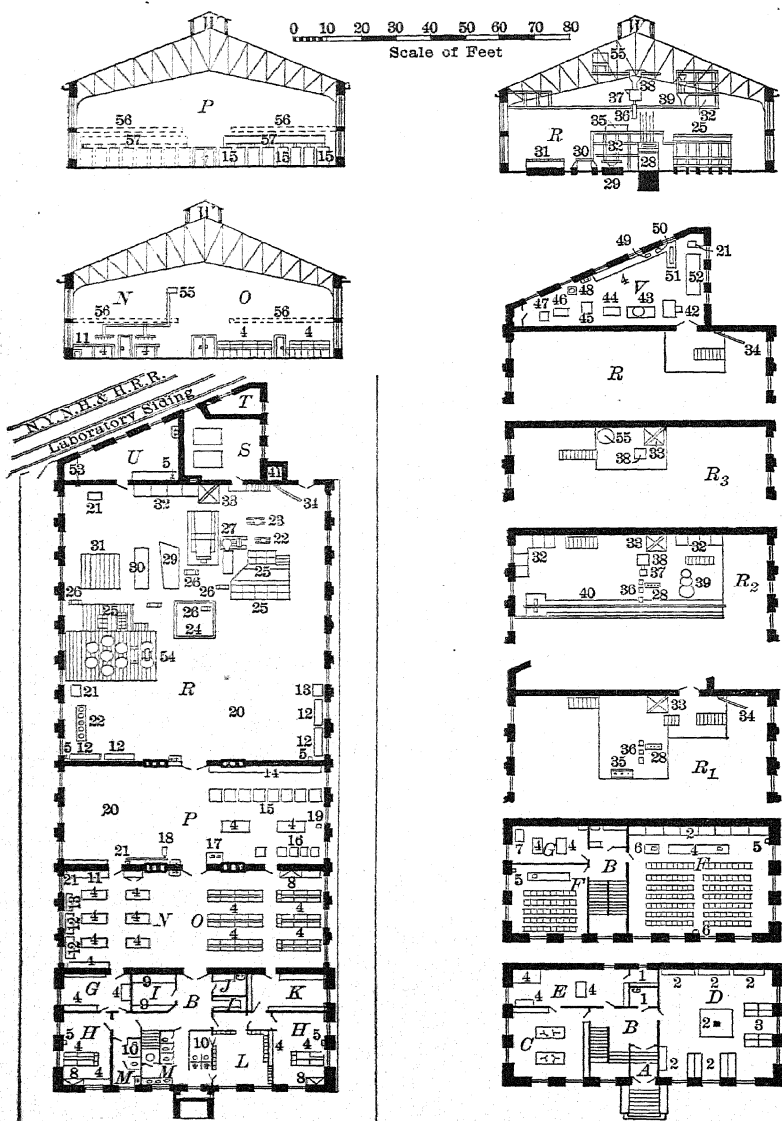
FLOOR-PLANS AND SECTIONS OF THE HAMMOND MINING AND METALLURGICAL LABORATORY.
